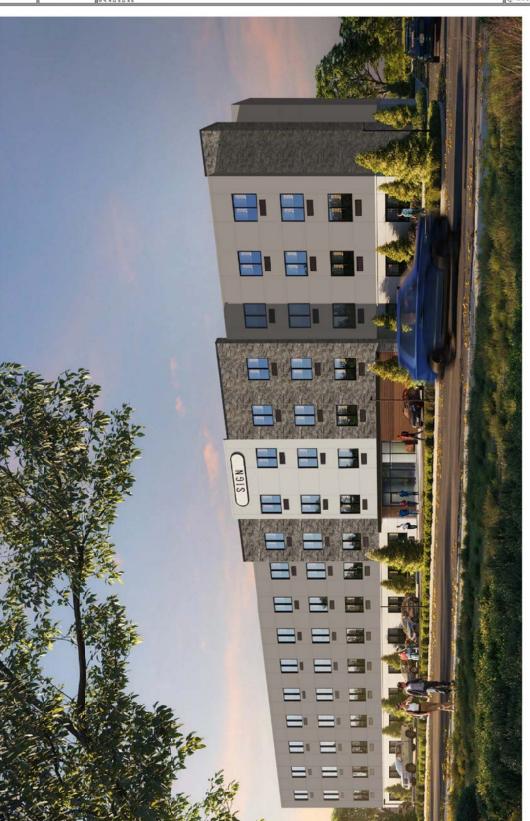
7, ARCHITECTURAL PLANS
